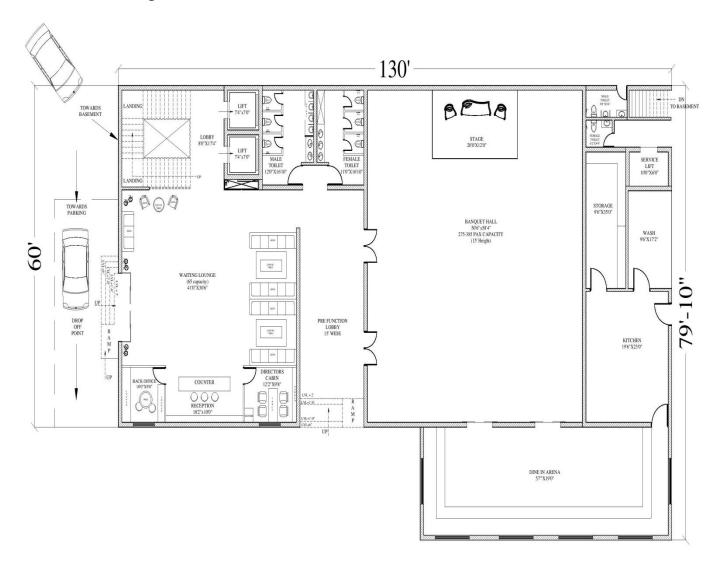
The Ground Floor Plan of the Main Hotel Campus of the Taj group of hotels at Mumbai.
